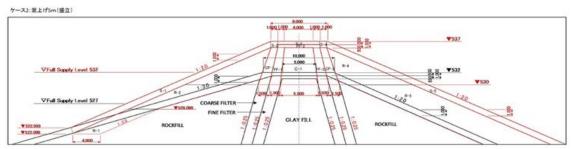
Outline Drawing in the case of 5m-Raising the Dam Body
